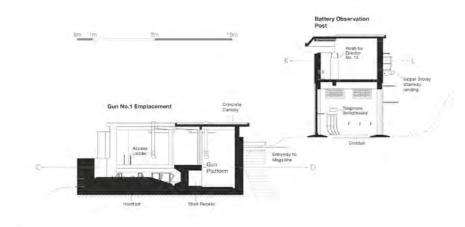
Pulau Ubin AMTB battery gun no. 1. Above: Plan view cross section. v: West elevation cross section. (Credit: Aaron Kao)
